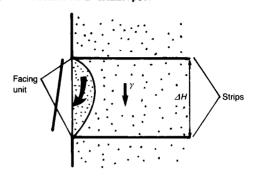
Failure mechanism of backfill soil near facing of wall
